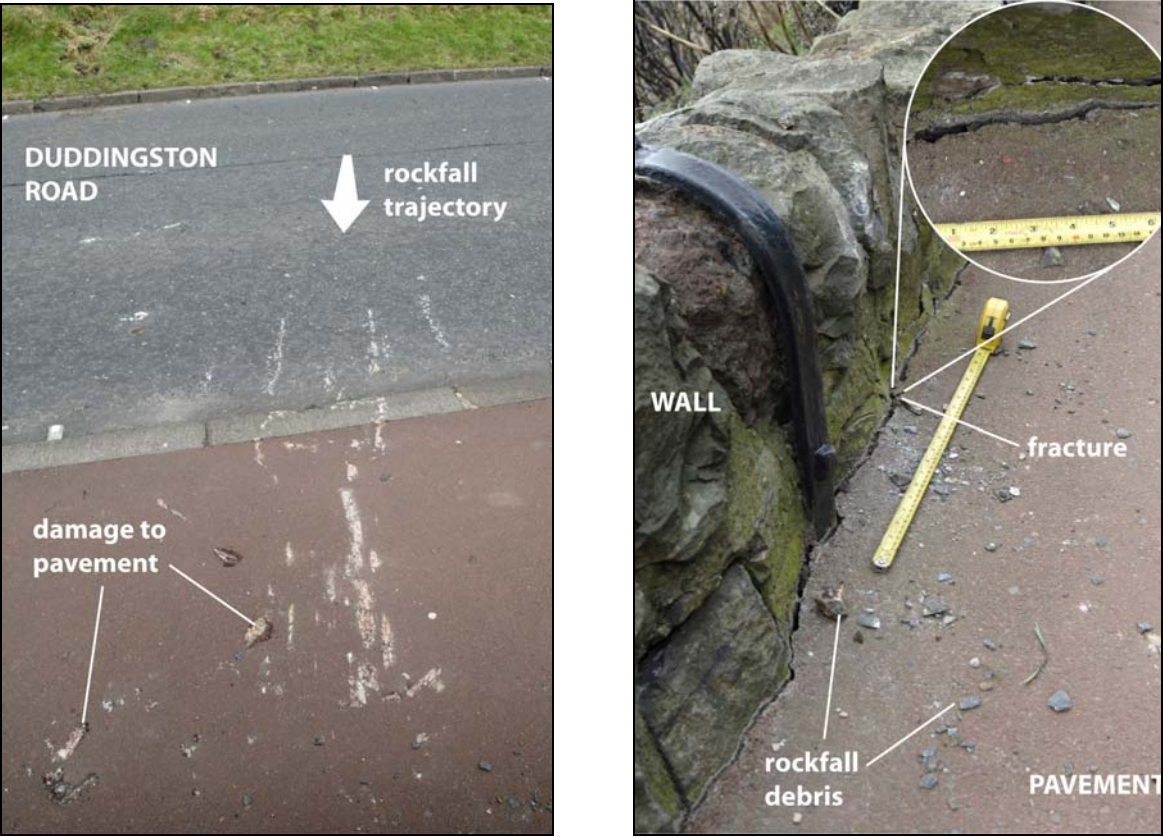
Damage to road , pavement and wall resulting from rockfall
